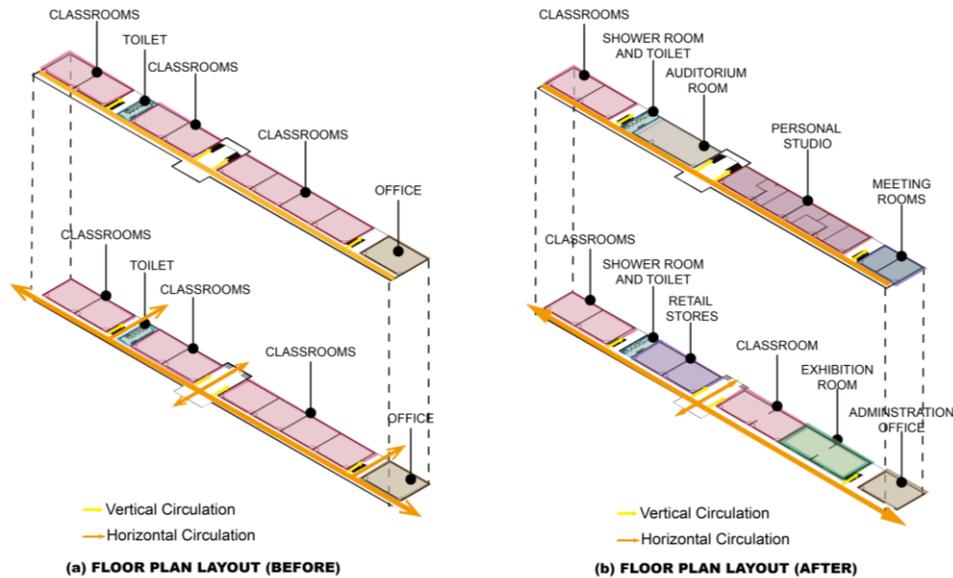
Floor Plans: (a)(b) NanHua Elementary School Floor Plans
